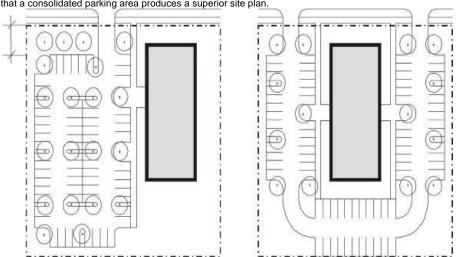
(D): Avoid parking that dominates the site. Encourage parking located behind or on the side of buildings and common open space between buildings.
